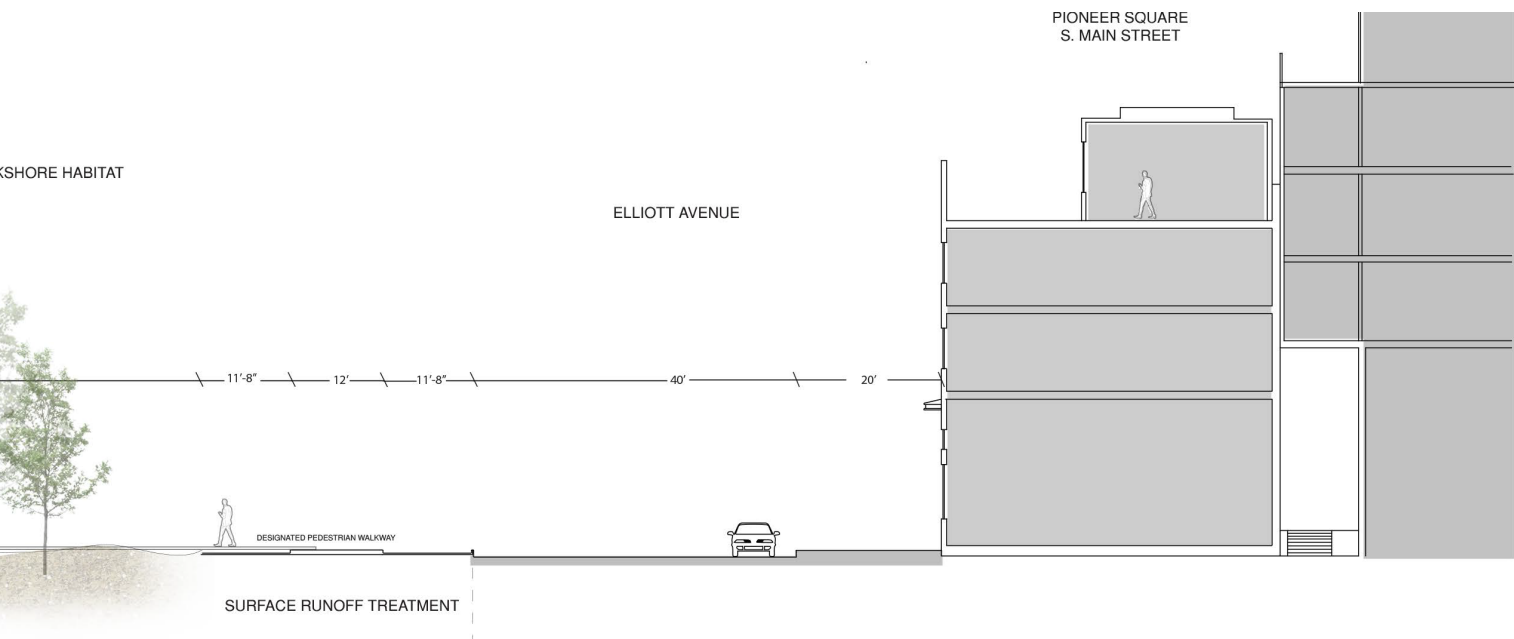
Cross Section between South Main Street and Pier 48 in Pioneer Square, Seattle, After Context Changes.
